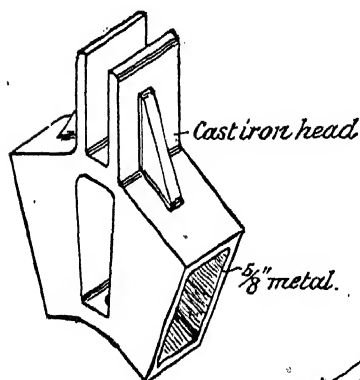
Sketch of Cast-iron Head for Joint at head of Principal Rafters and King-rod.
